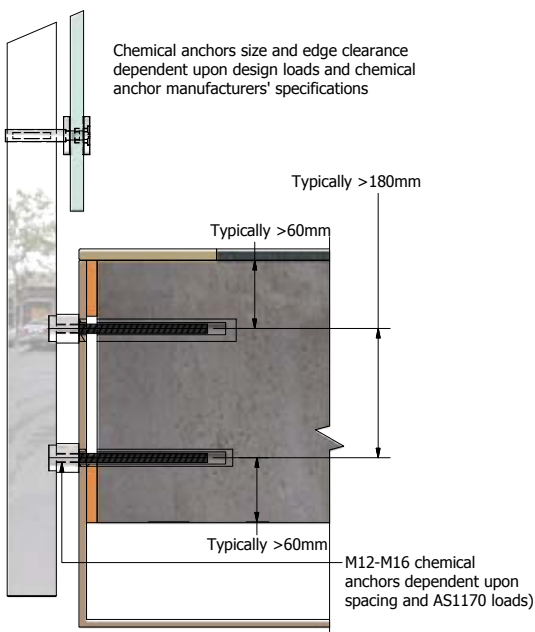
Thin concrete fixing detail. Underslab fixing achieves structural design loads and appropriate fixing spacing on a limited structural face. Slotted cylindrical stand-off stanchion connections fulfill a structural role and achieve a satisfactory geometric design detail. Glasses are in the opposite handrail-side of the stanchion, allowing glass to hang.
